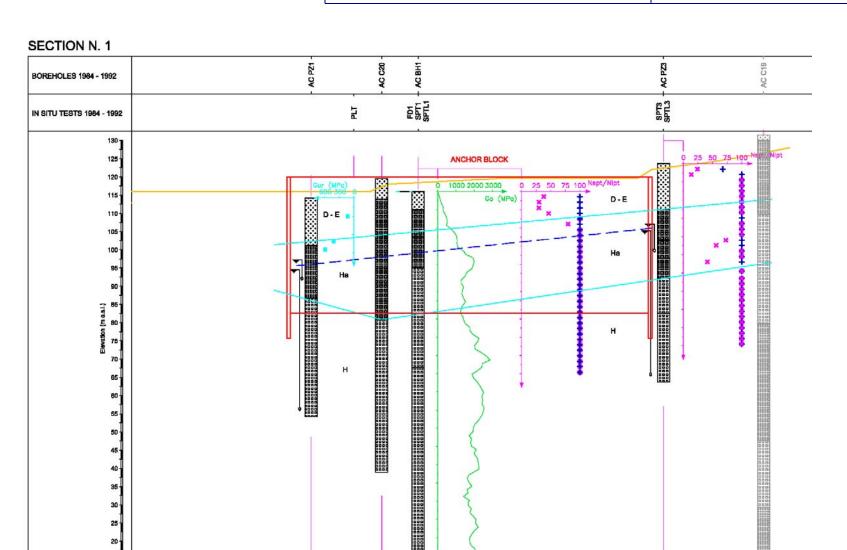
Calabria Anchor Block, cross section (section No. 1)
